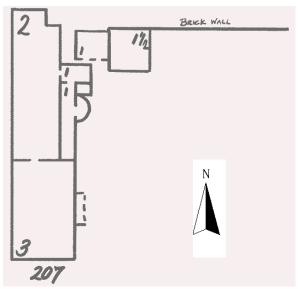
Plan of 207 Prince Street, based on an 1896 Sanborn Fire Insurance Map. Note the enclosed, one-story addition on the east side.
